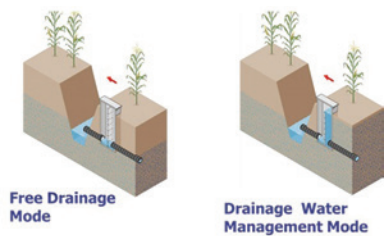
■ Control structure on drain outlet facilitating Drainage Water management.
